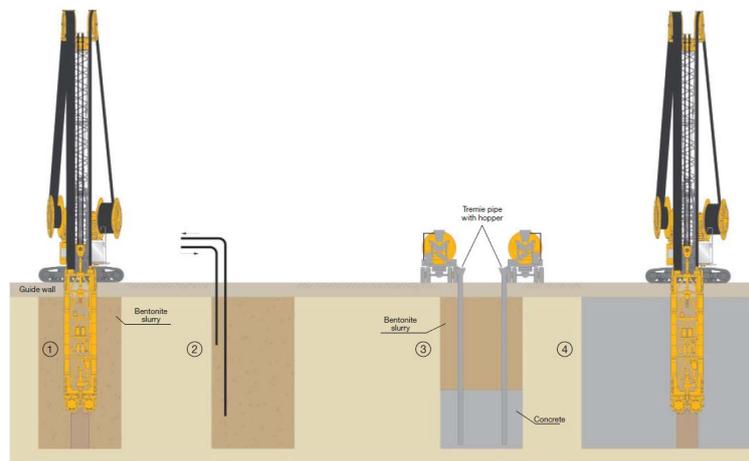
Construction of a Cut-Off Wall with the Two-Phase Method [27]
